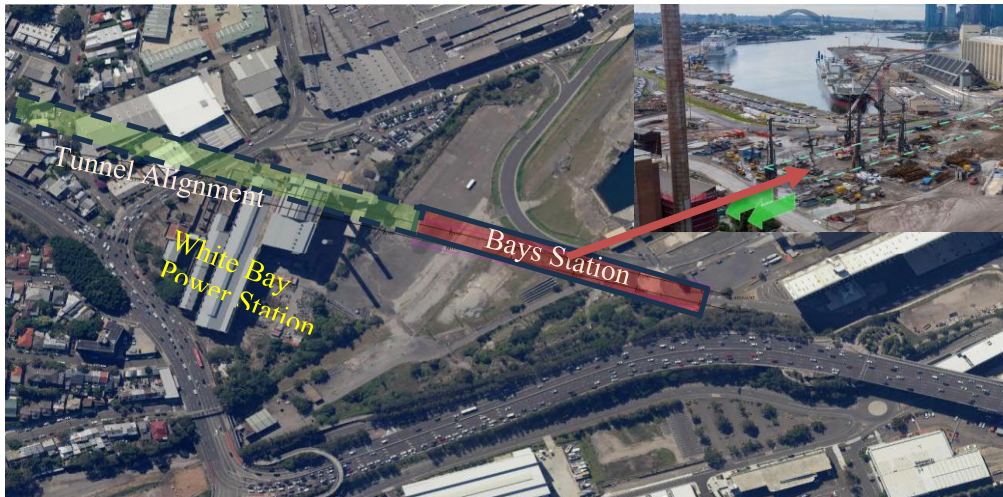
The Bays Station excavation, tunnel alignment and White Bay Power Station location with five piling rigs working simultaneously. The green arrows show the direction of TBM.
